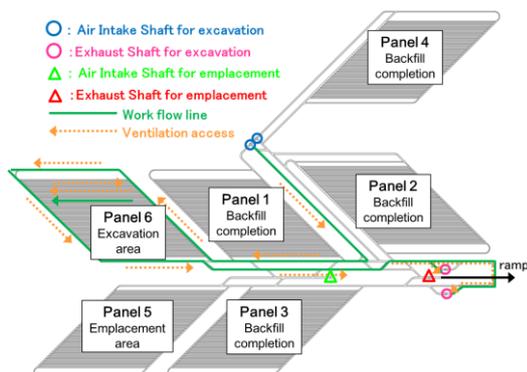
DGR layout and ventilation access for the period of construction in crystalline rocks.
